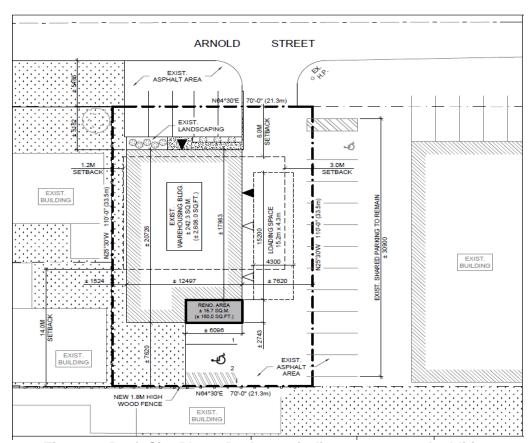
Draft Site Plan – Dark grey indicates proposed addition
